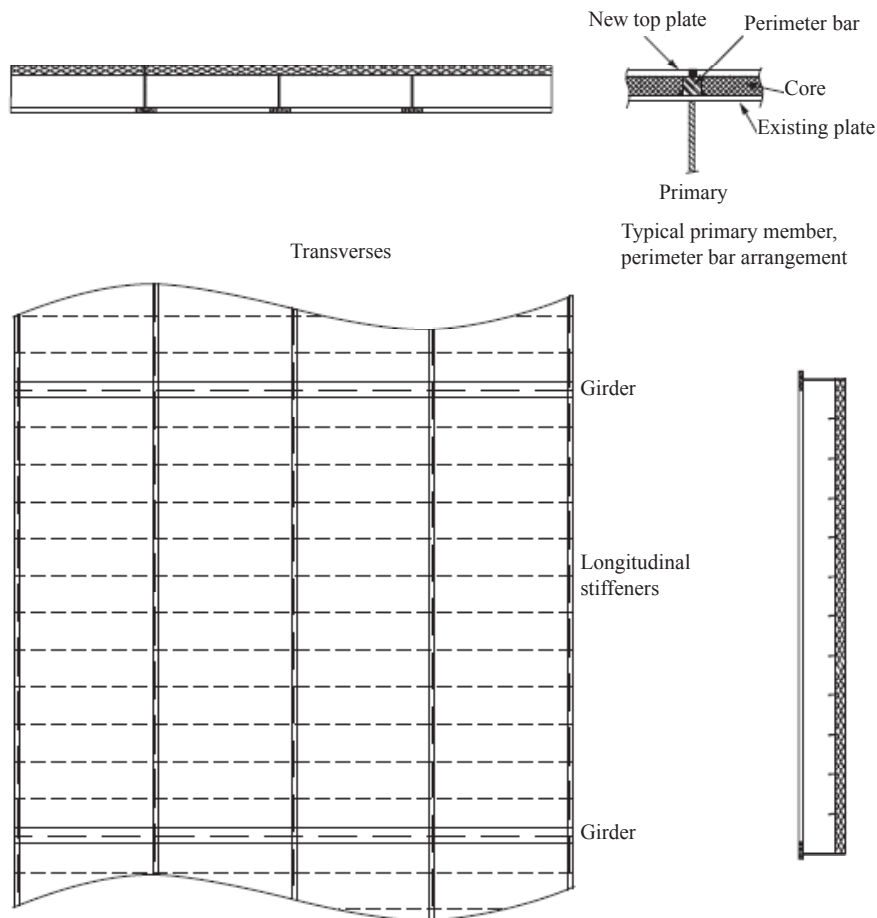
Diagrammatic arrangement of a typical sandwich new construction (for illustration only and not to scale)
